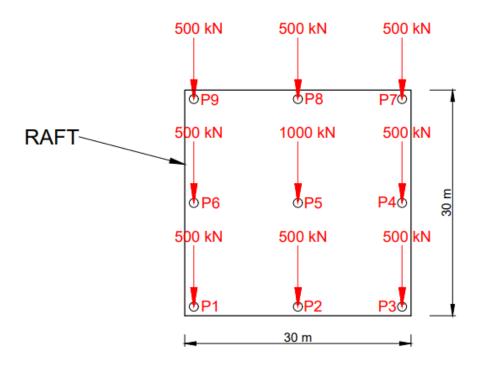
Plan Showing Arrangement of Piles in Piled Raft Foundation.
